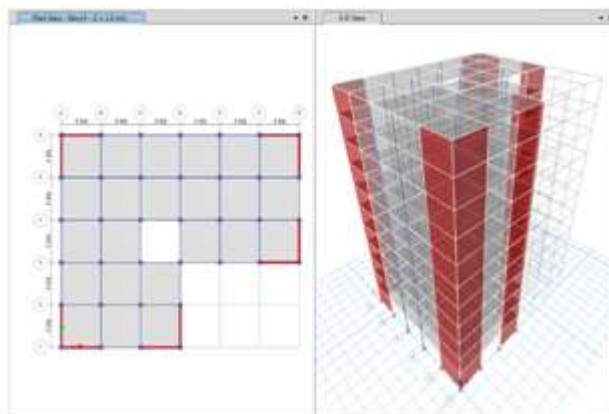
Building frame with shear wall at all exterior corners of building (M5)
